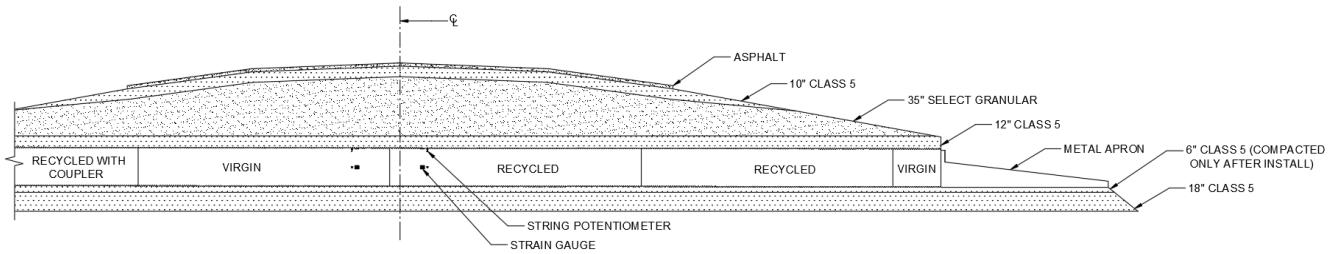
Layout of the pipes installed underneath the eastbound lanes
